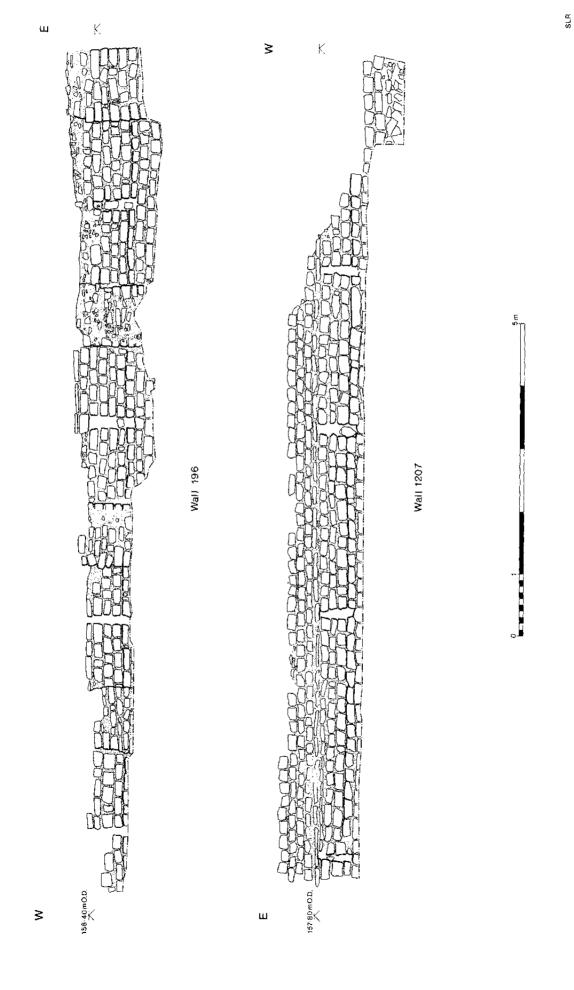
Elevations F (south face of south wall (196) Building 198) and G (north face of north wall (1207) Building 197) (for locations see Figs 69, 70)
